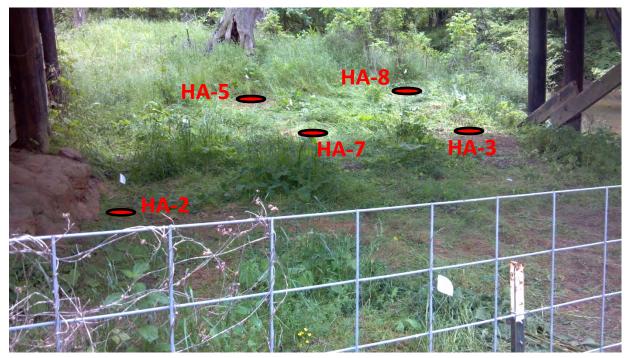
Locations of HA-2, HA-3, HA-5, HA-7 and HA-8. The photo was taken looking west from the east.
